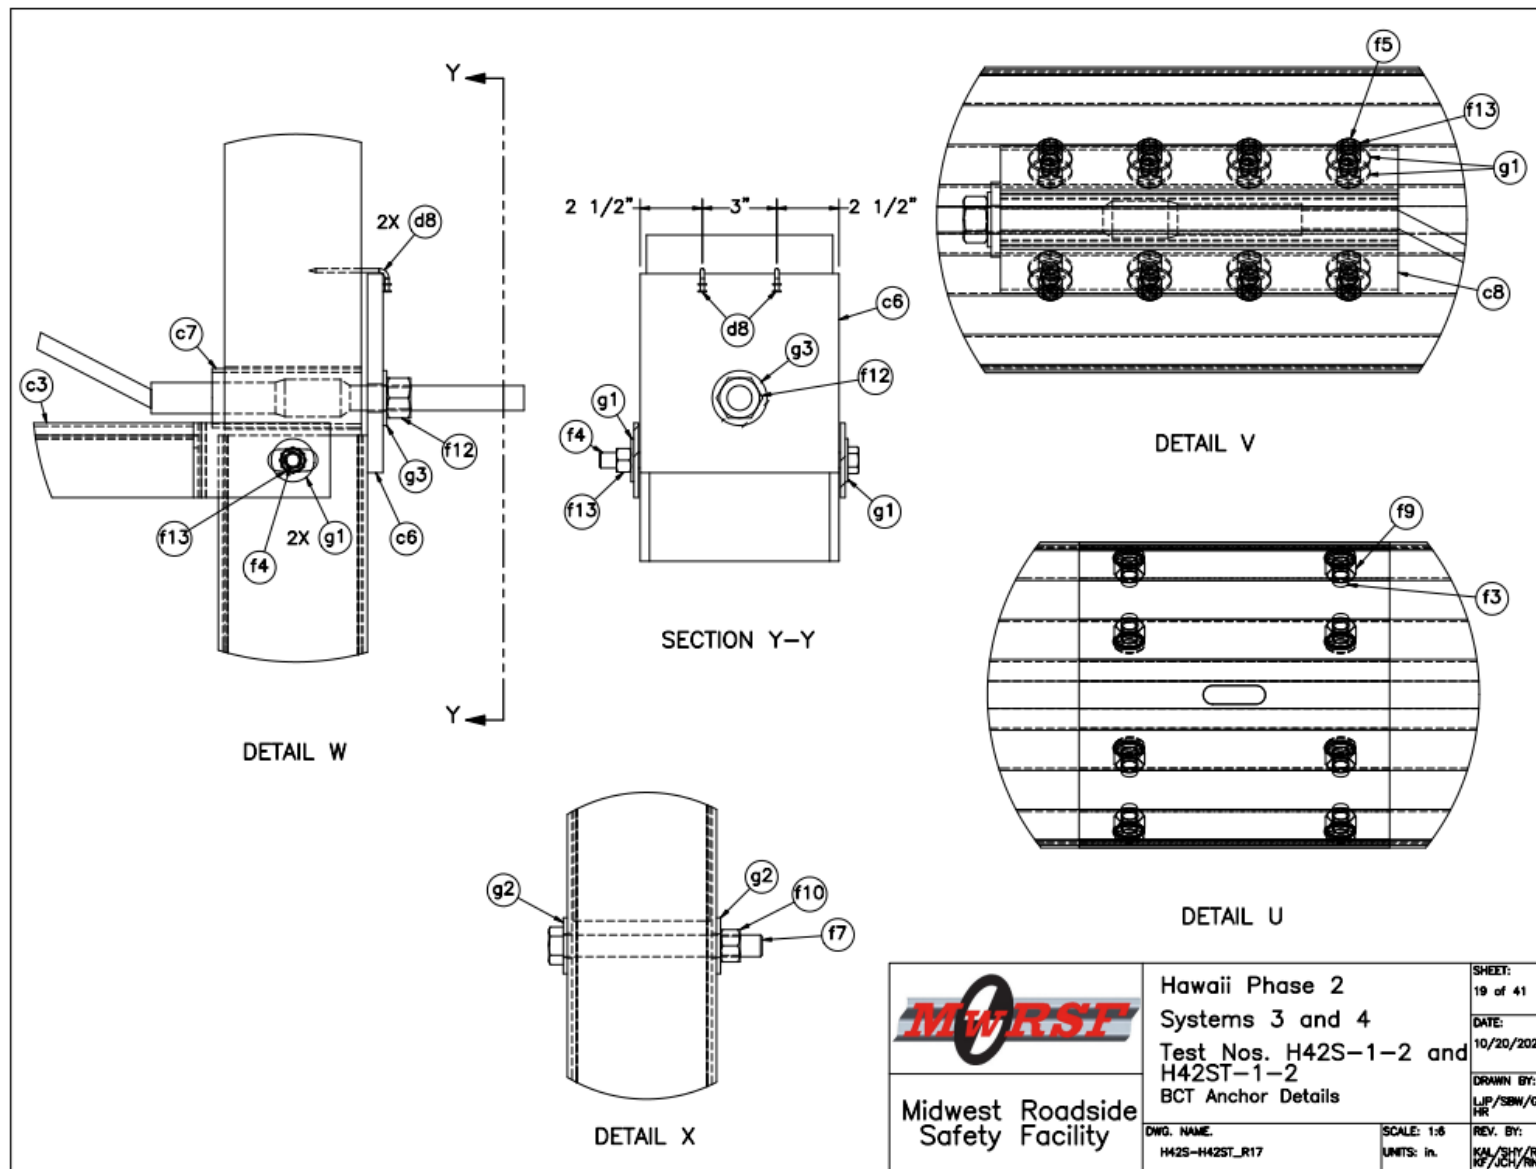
BCT Anchor Detail, Test Nos. H42ST-1 and H42ST-2
